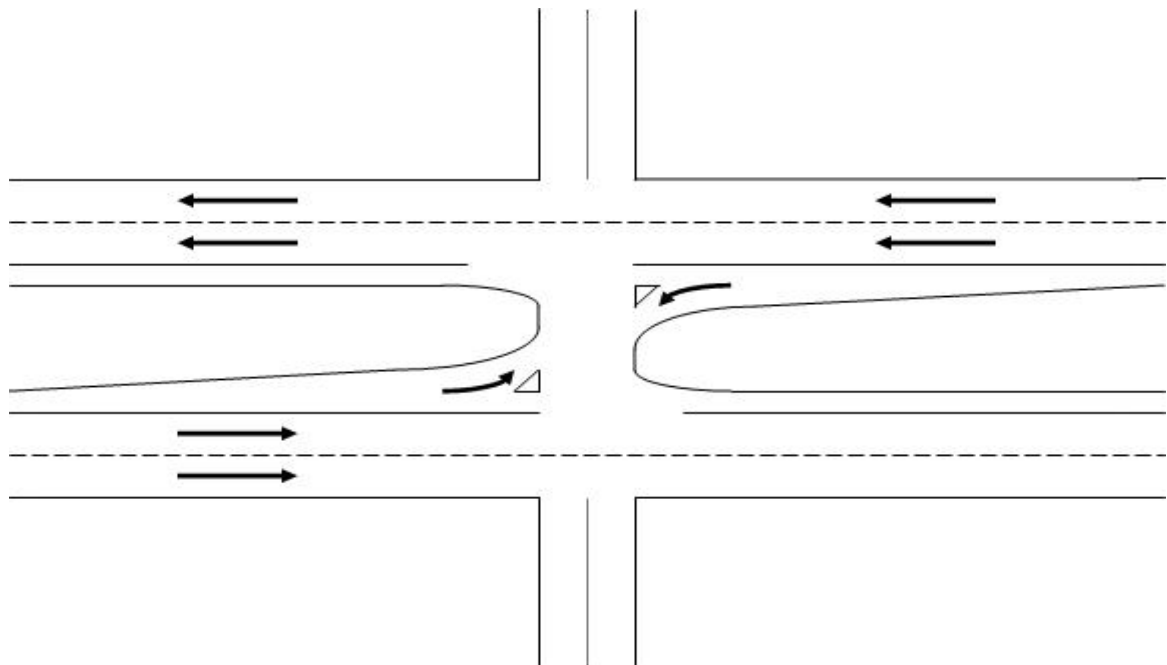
Typical layout of a median opening on 4-lane Road
